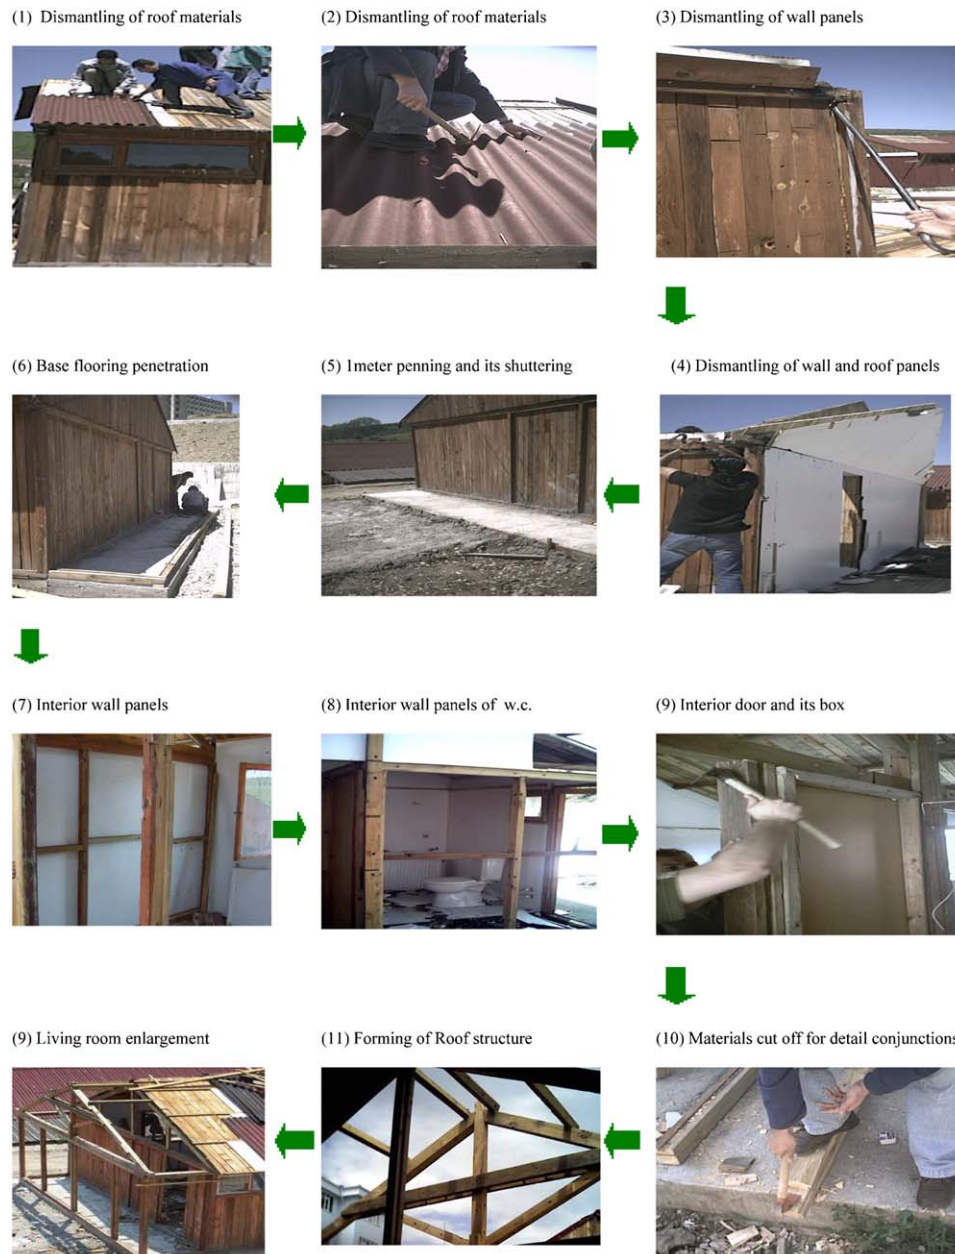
Process of dismantling temporary house and reconstructing permanent house.
